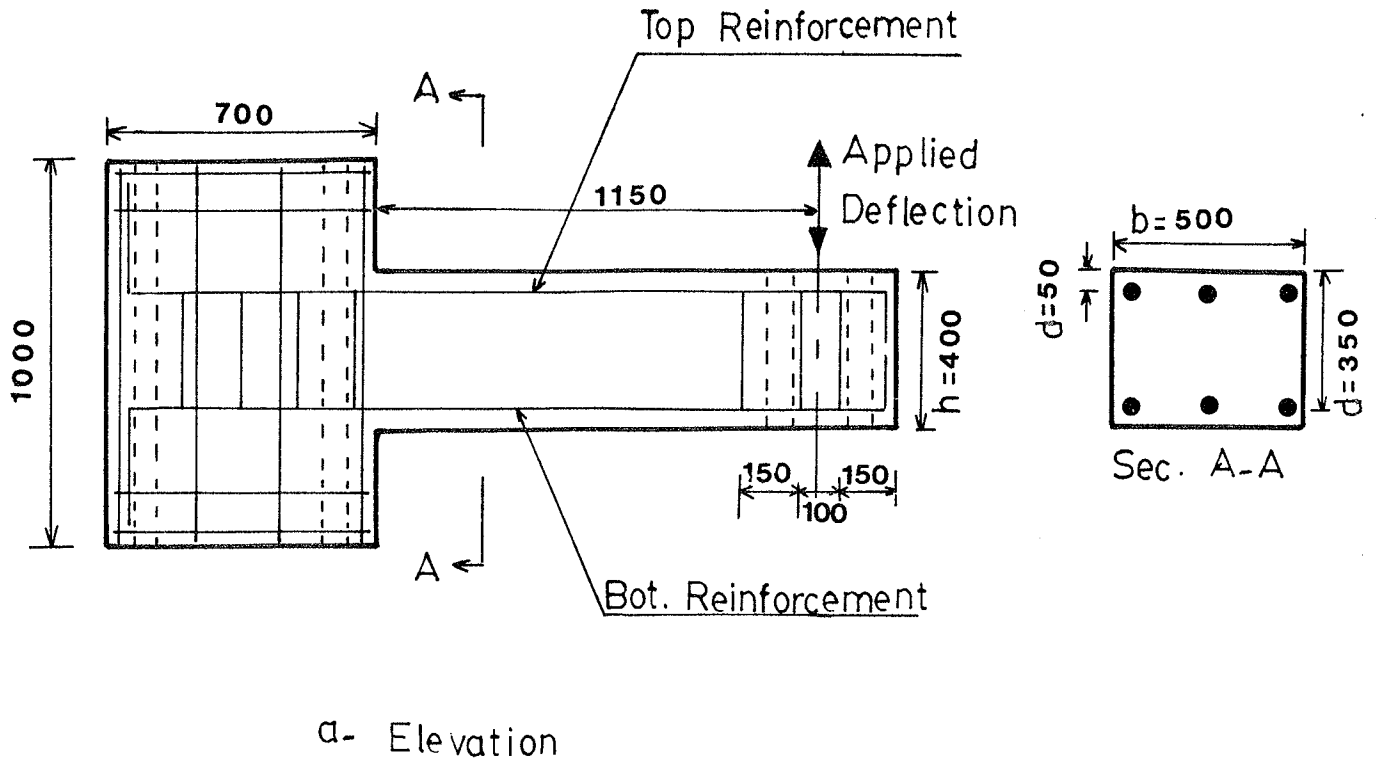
REINFORCEMENT DETAILS AND DIMENSION OF A TYPICAL SPECIMEN.
